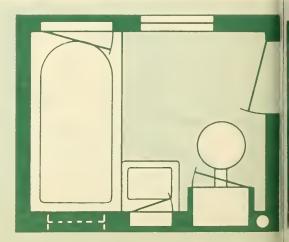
Bathroom, 5 by 61/2 feet, has space for door to open into room.
